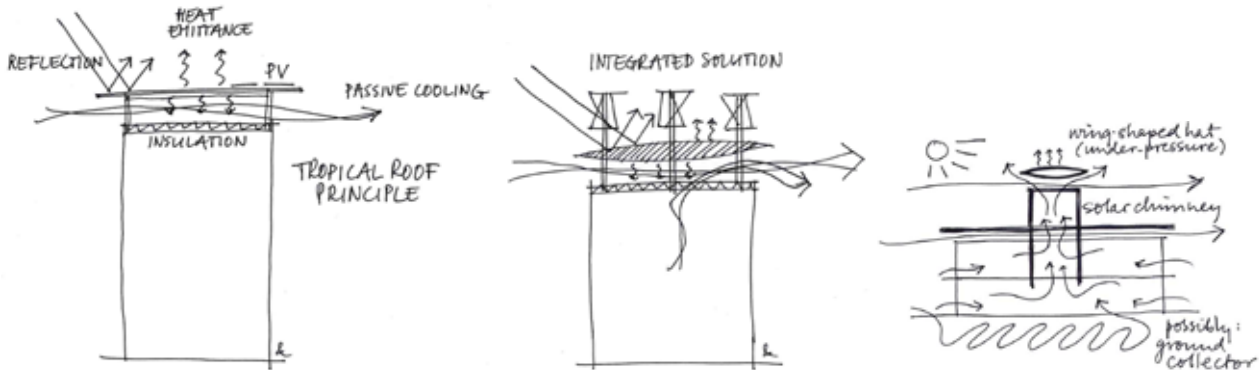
Tropical roof principles: the normal solution (left), an upside-down wing-shaped tropical roof (centre) and an upside down wing-shaped hat on a solar chimney (right).
